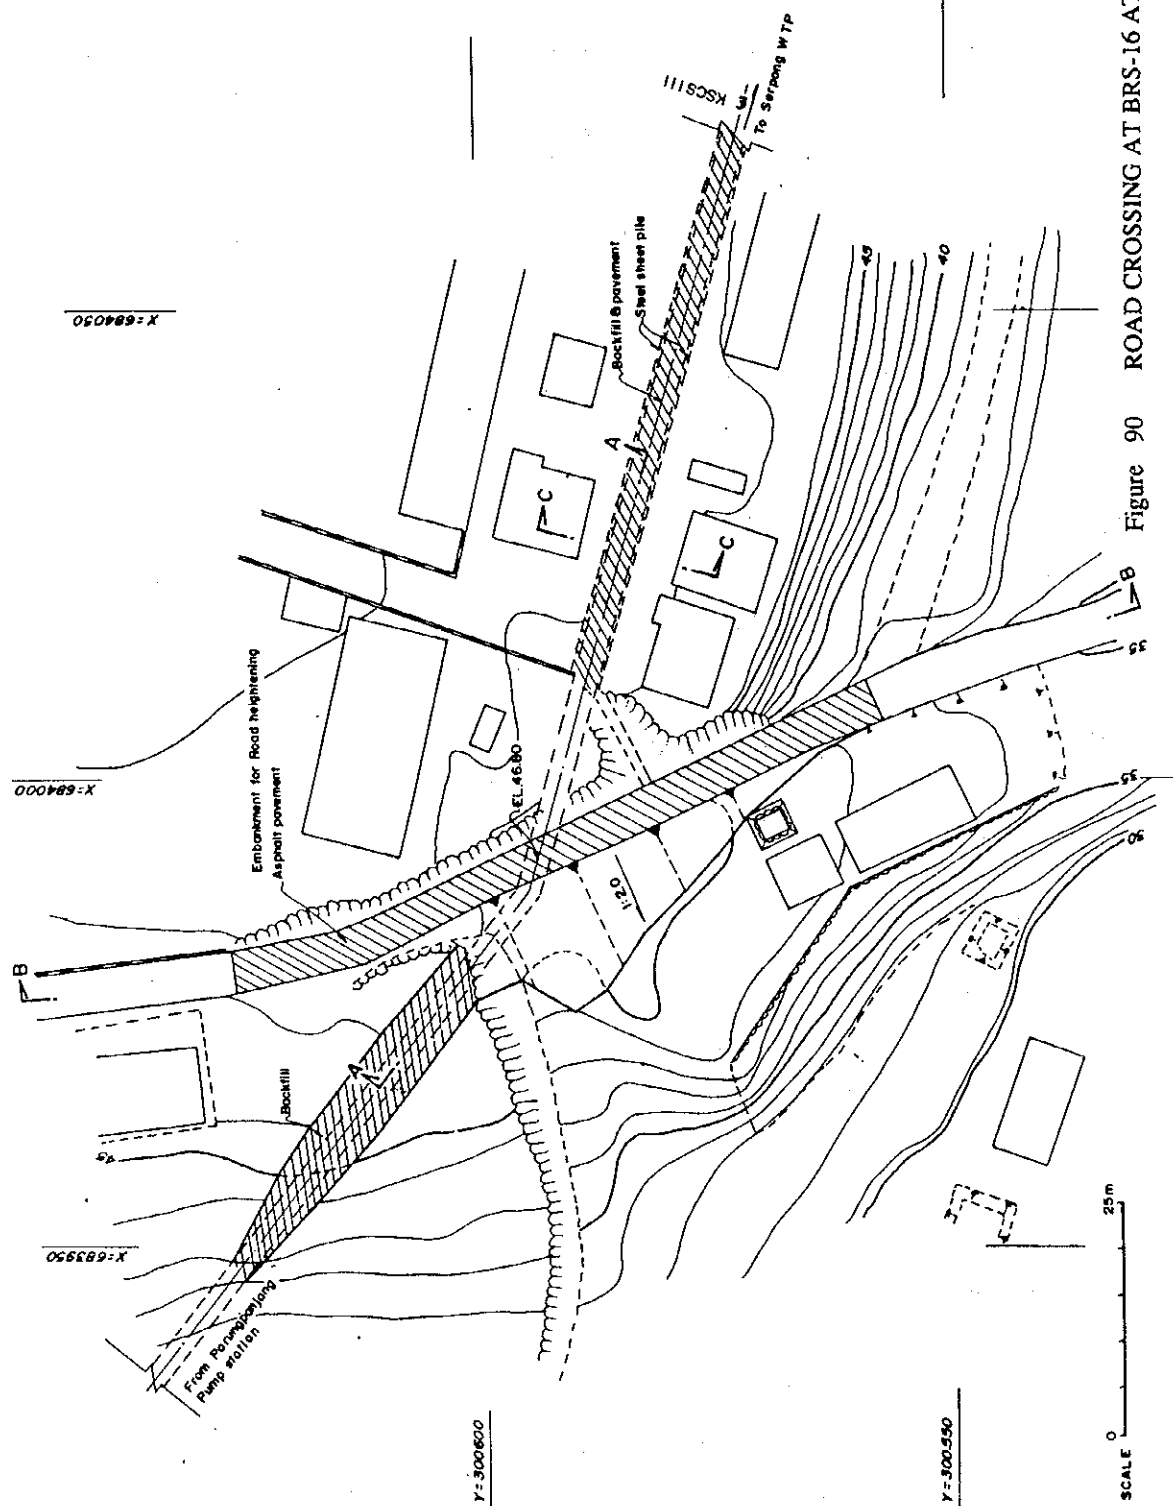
ROAD CROSSING AT BRS-16 AT DESA SERPONG (1/2)
